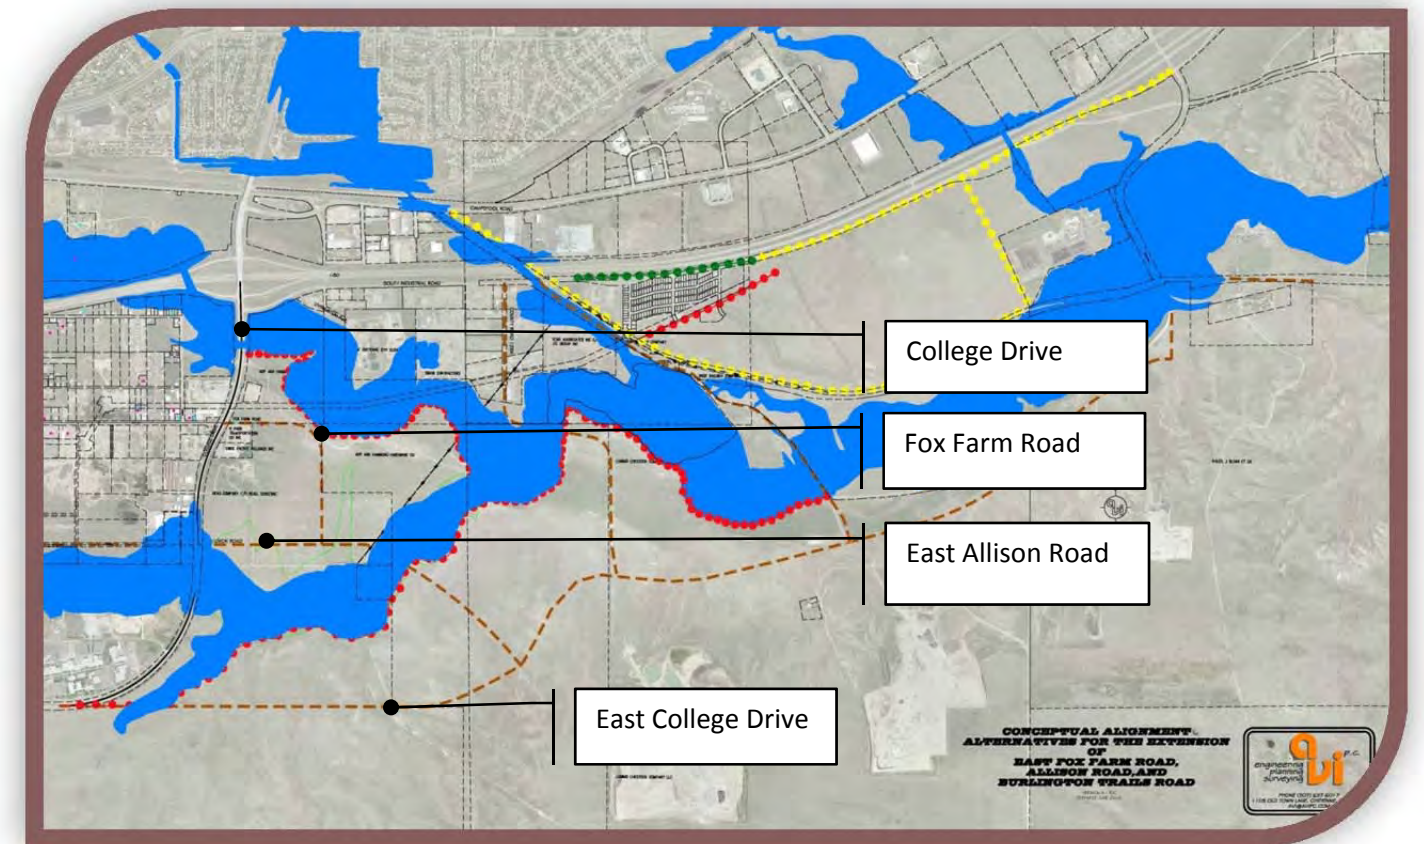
Conceptual Roadway Alignments East of College Drive (East College Drive Primary Route)
